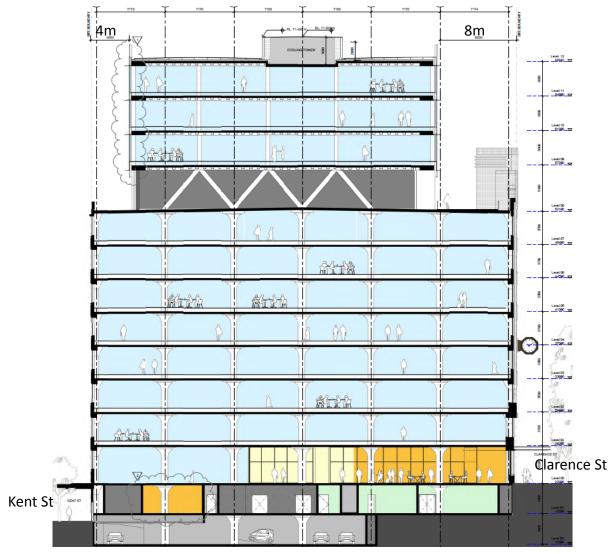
Cross Section (east-west) of approved Red Cross House development
